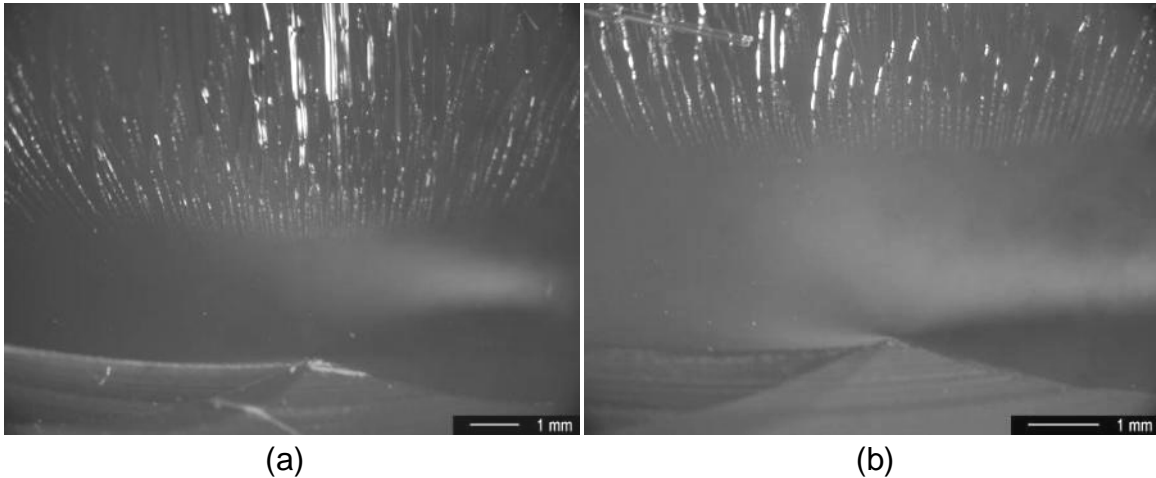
Images showing the fracture surfaces of (a) GB2-3 and (b) GB2-4.
